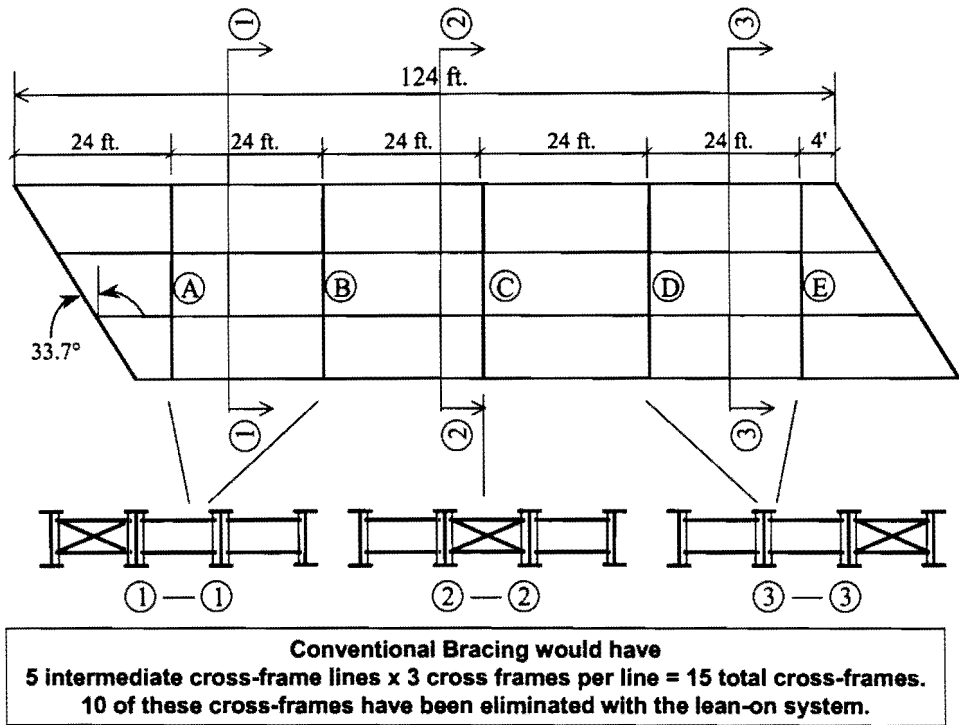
Proposed Geometric Layout for Lean-On Bracing System
